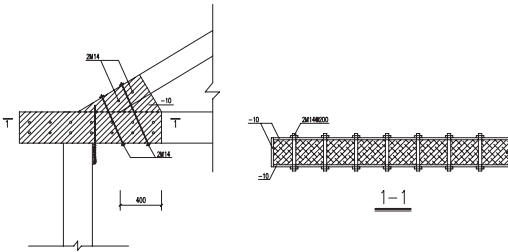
Diagram of strengthening ending joints of the wood roof truss.
